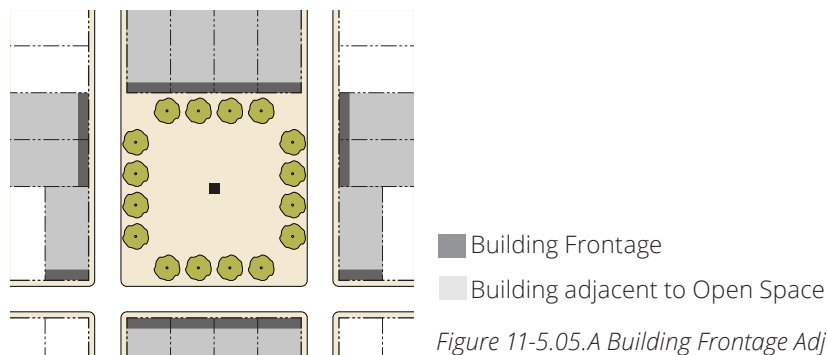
A Building Frontage Adjacent to an Open Space
